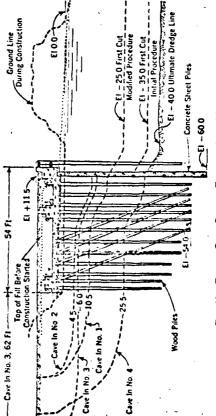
TYPICAL CROSS SECTION THROUGH QUAY WALL
